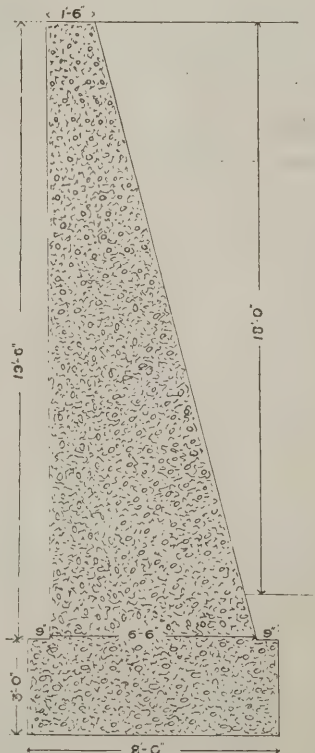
CROSS-SECTION OF CONCRETE RETAINING WALL, BRITISH DESIGN.
